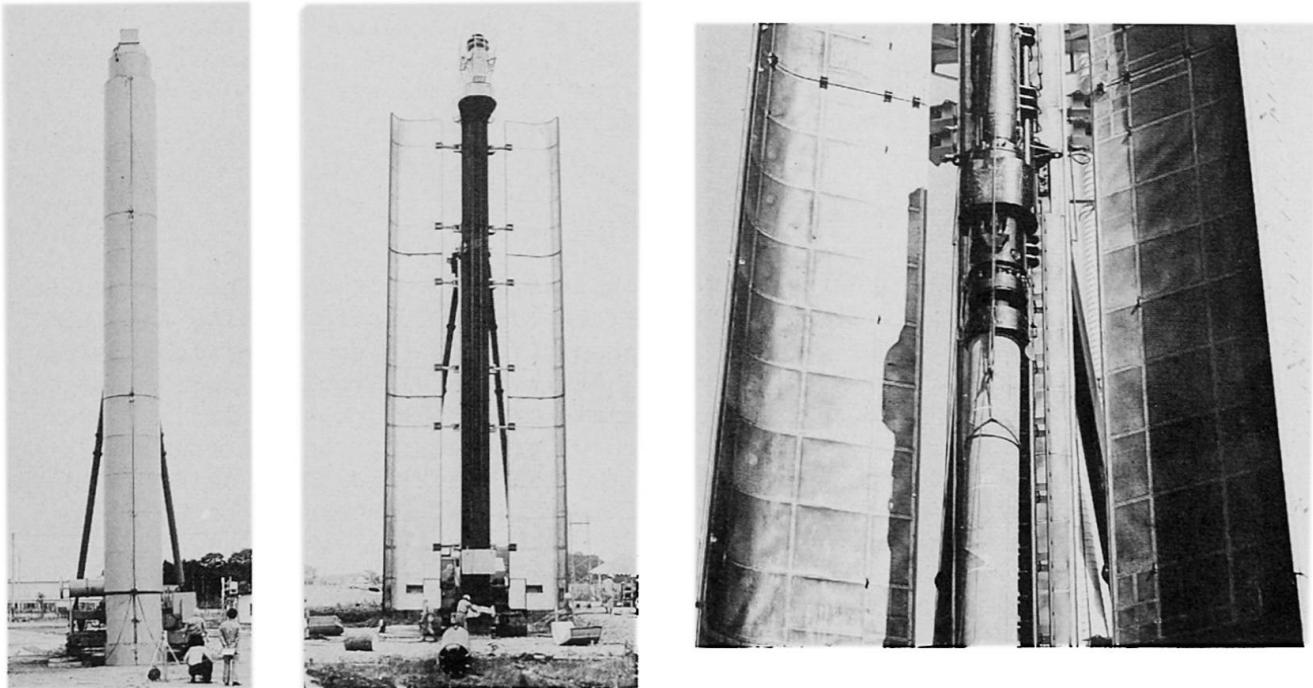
Noise-Reducing Cover for Pile Driving Rig (Photo courtesy of the Japan Association for Steel Pipe Piles)
